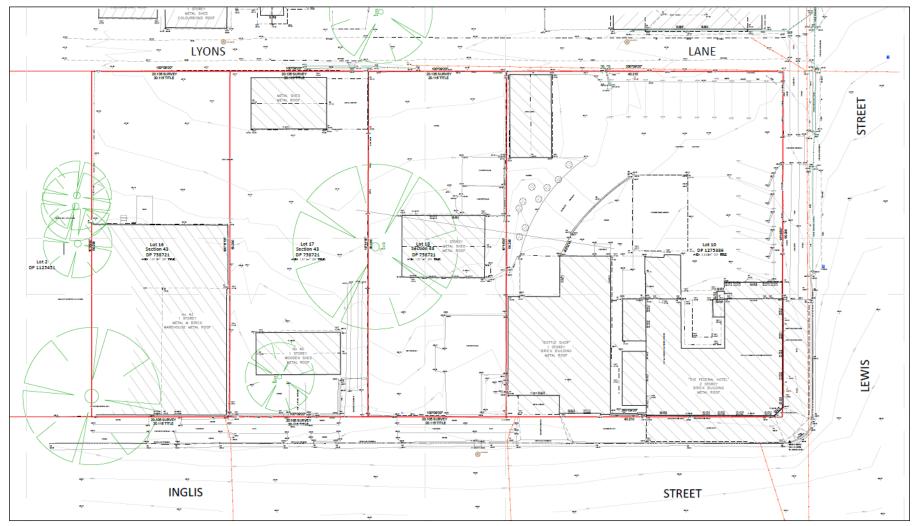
Survey Plan of the subject site - 34-42 Inglis Street, Mudgee. (Source: VMark Survey Pty Ltd)
